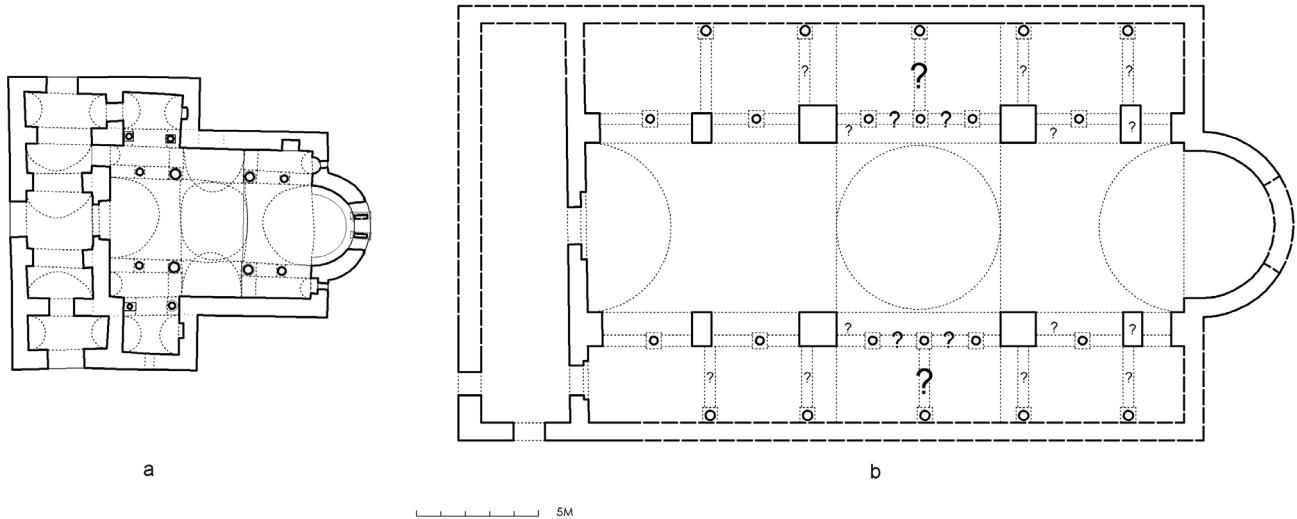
(a). Santorini. Episkopi in Mesa Gonia. Reconstructive plan. (b) Santorini. Hagia Eirini at Perissa. Reconstructive plan of the second construction phase.
